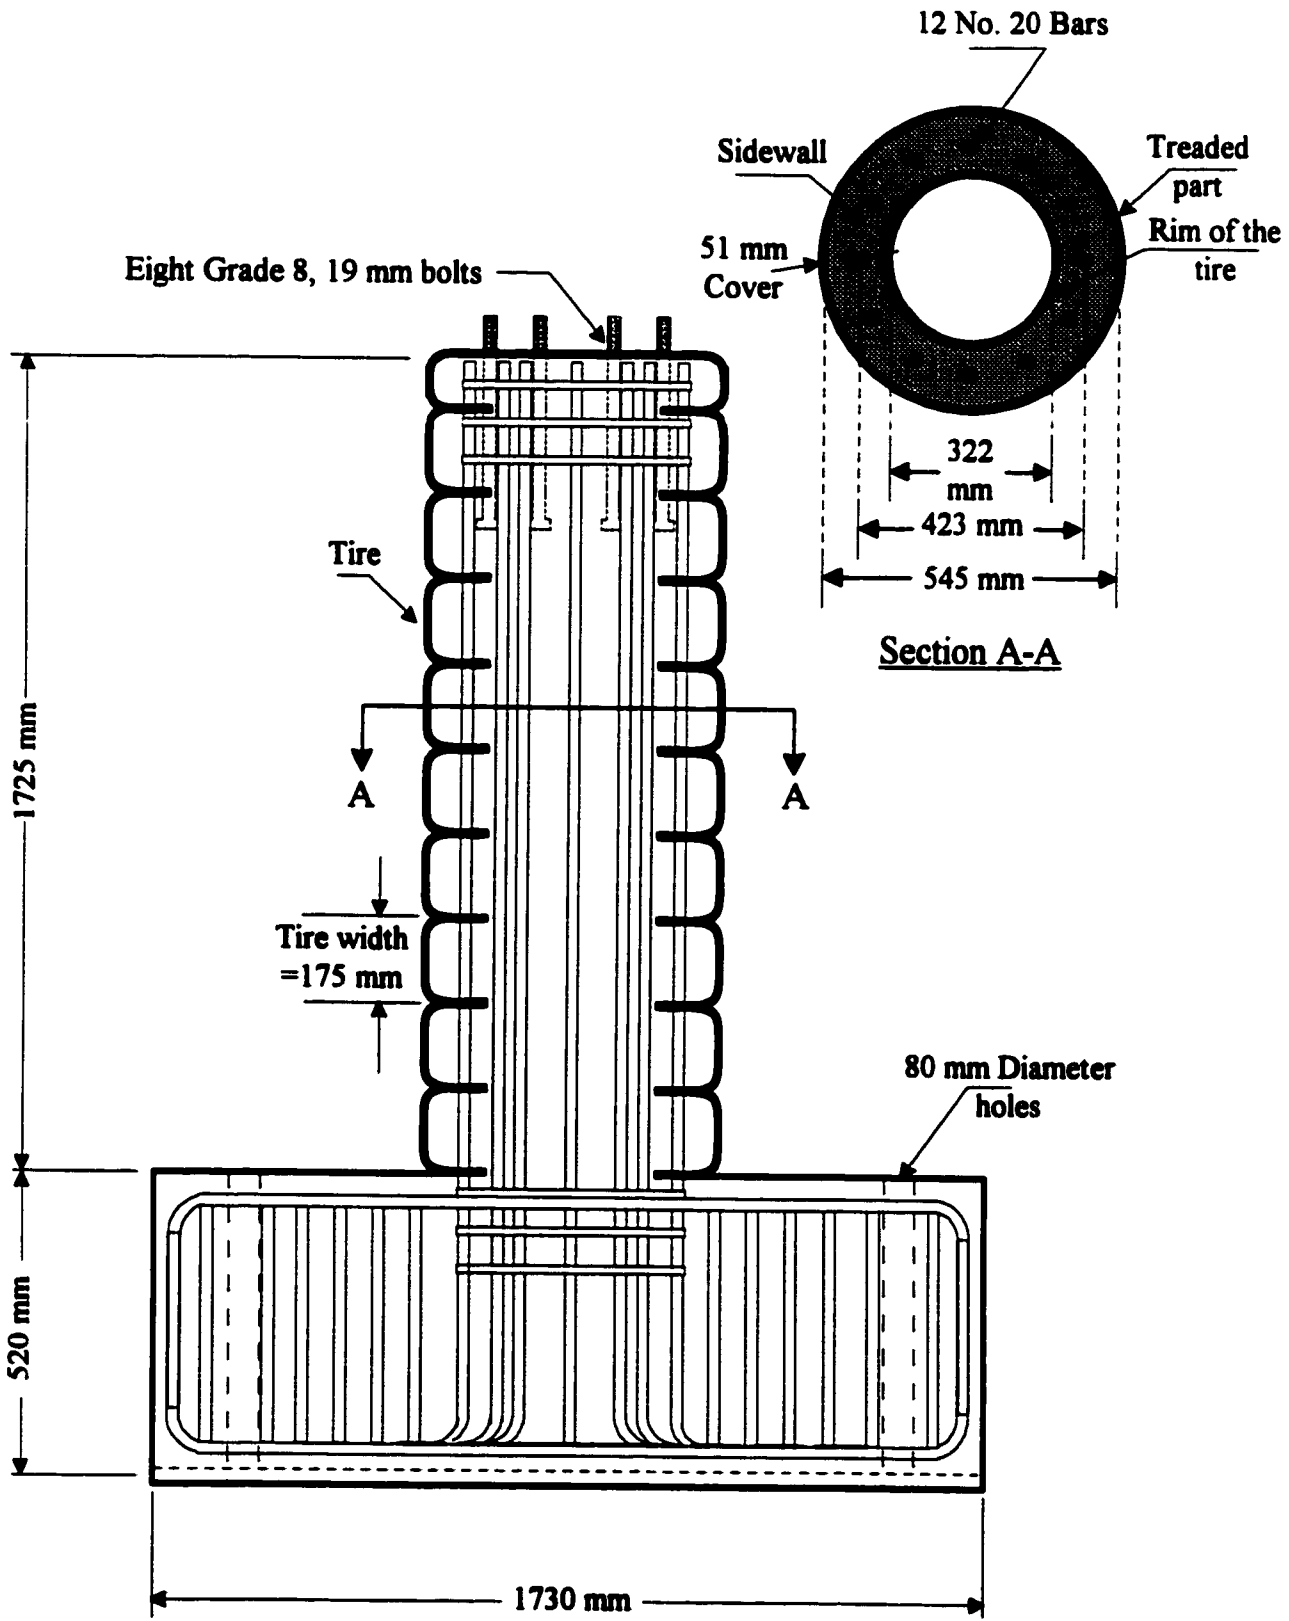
Reinforcement Details for Columns TC-1 and TC-2
